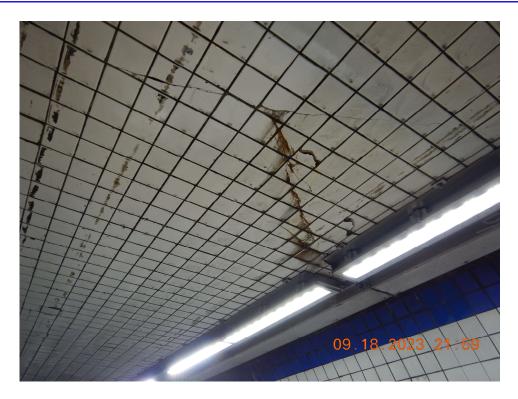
Sta. 195+65 – Cracked Ceiling Tiles with Rust Stains over NB Lane
